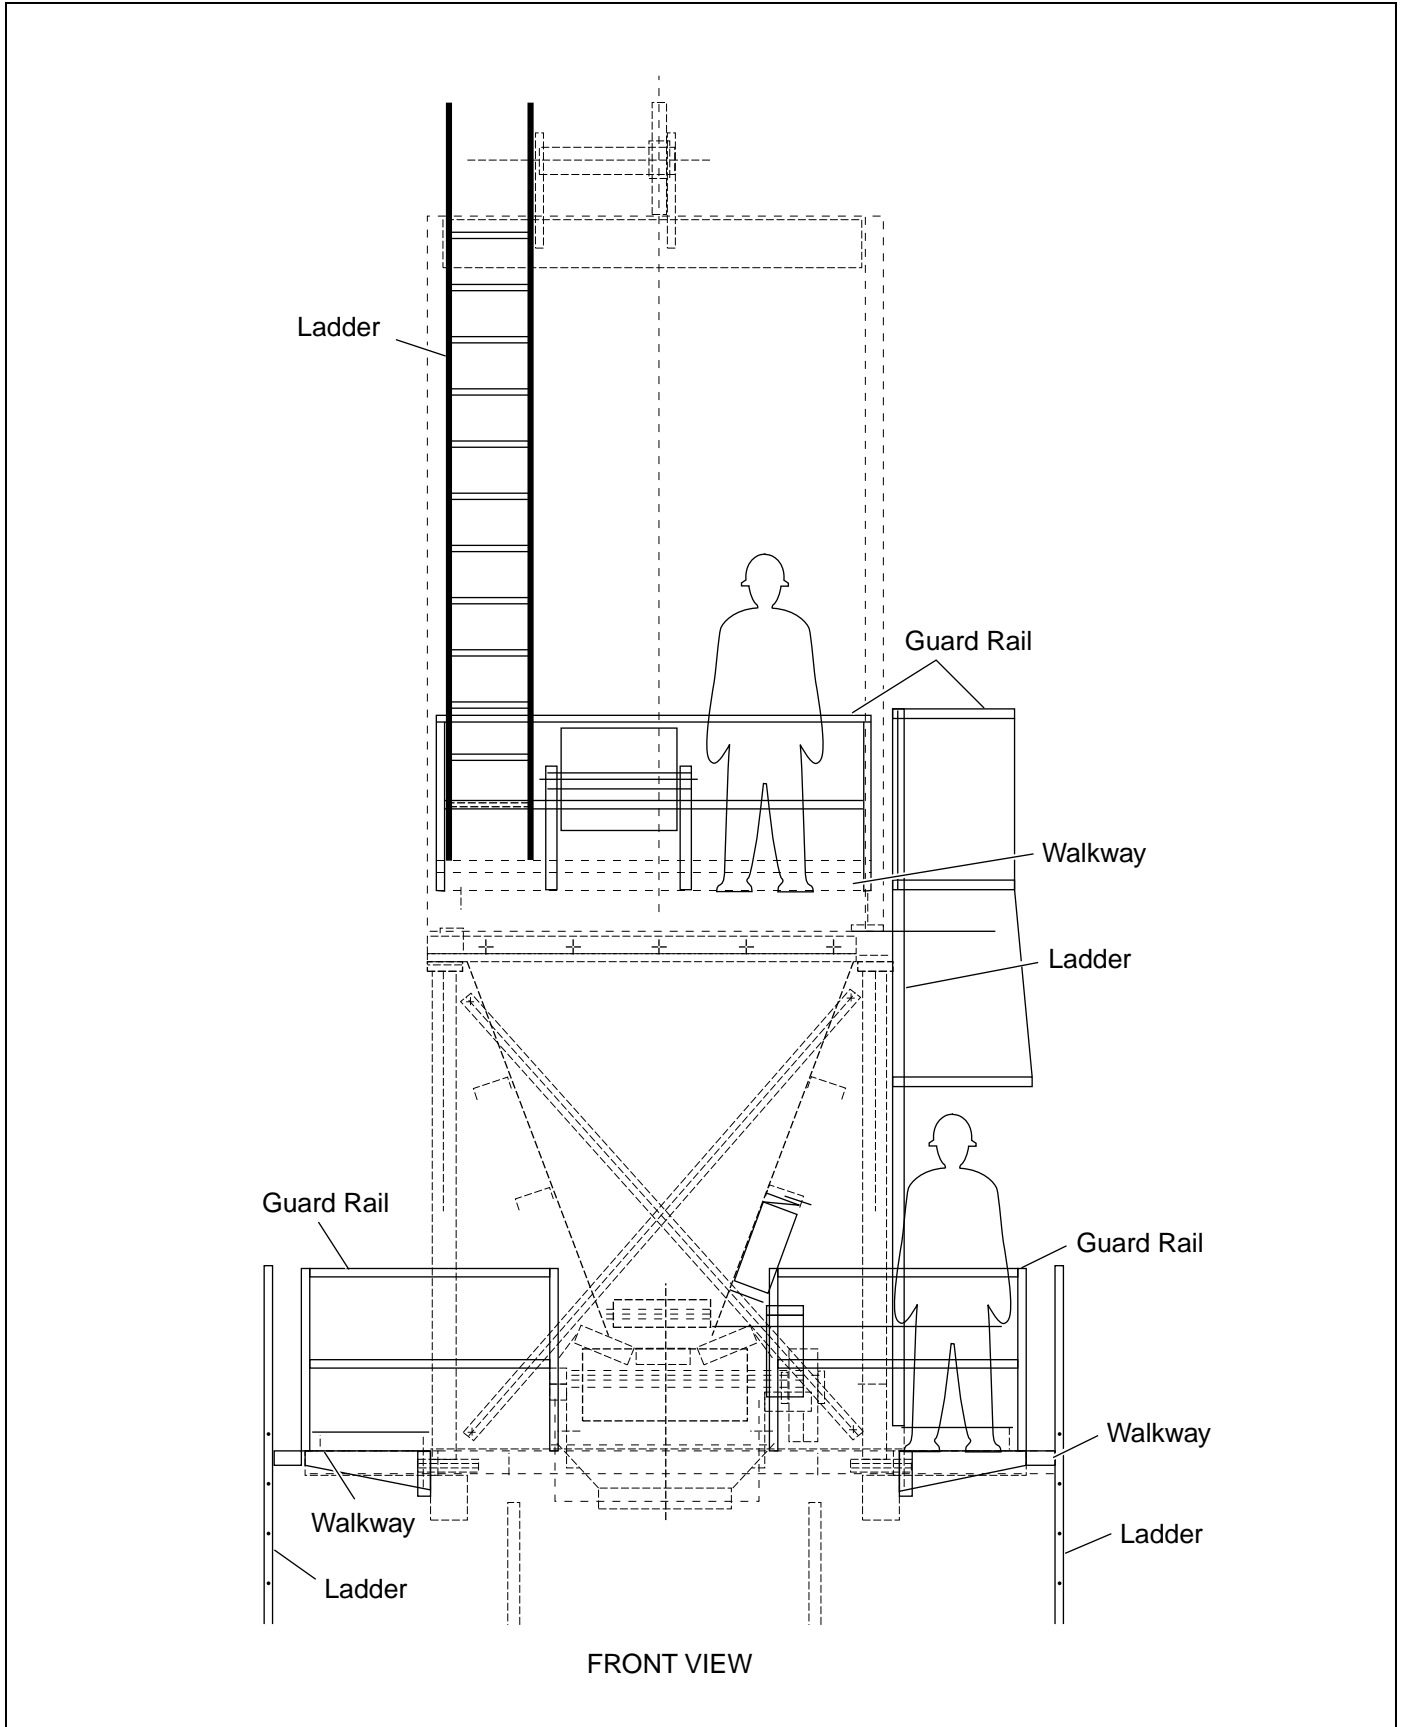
Ladders, Guard Rails and Walkways – Front View
